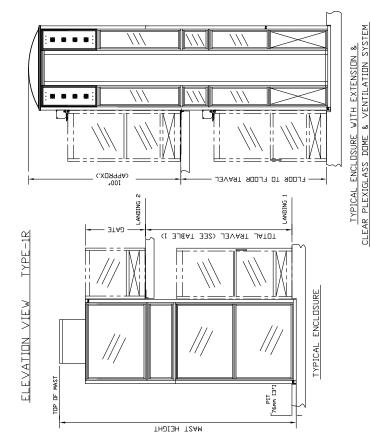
Elevation and plan view, enclosure application (Type 1R)
